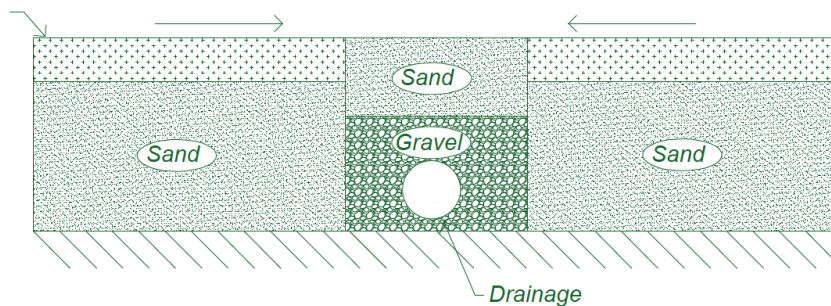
Cross-section of the wastewater sludge field with solid base (asphalt or concrete)
